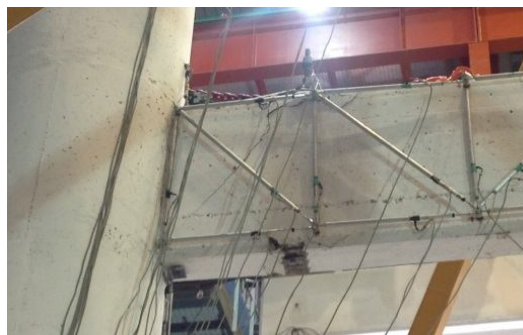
Crack pattern in the first transverse beam of tall pier after *test k12
